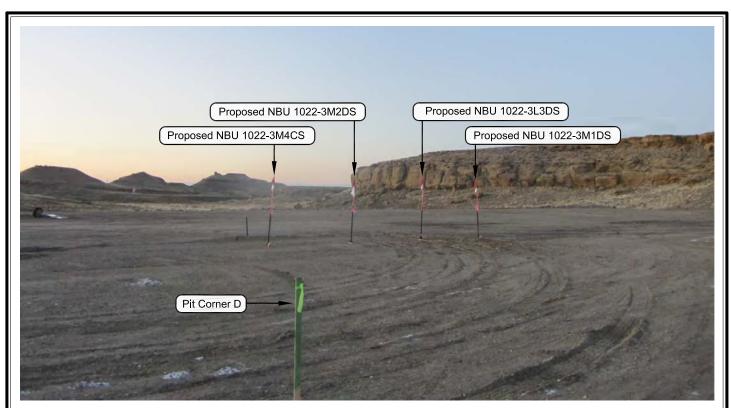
PHOTO VIEW: FROM PIT CORNER D TO LOCATION STAKE
